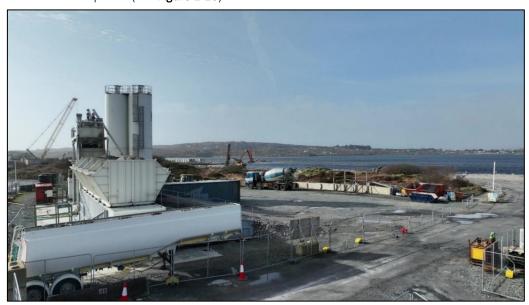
Photograph of the mobile Concrete Batching Plant and water storage tank.
